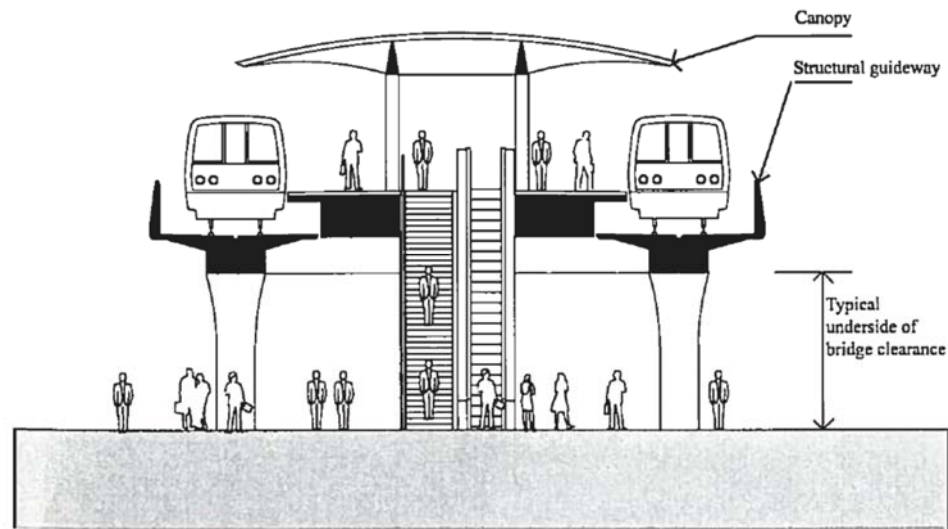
Schematic section of an elevated station (Griffin, 2004).
